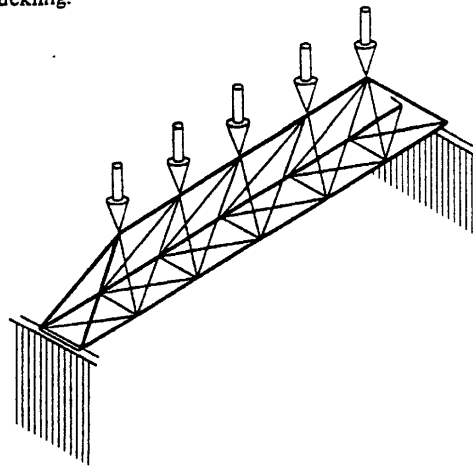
Lateral buckling of planar truss without any bracing.
